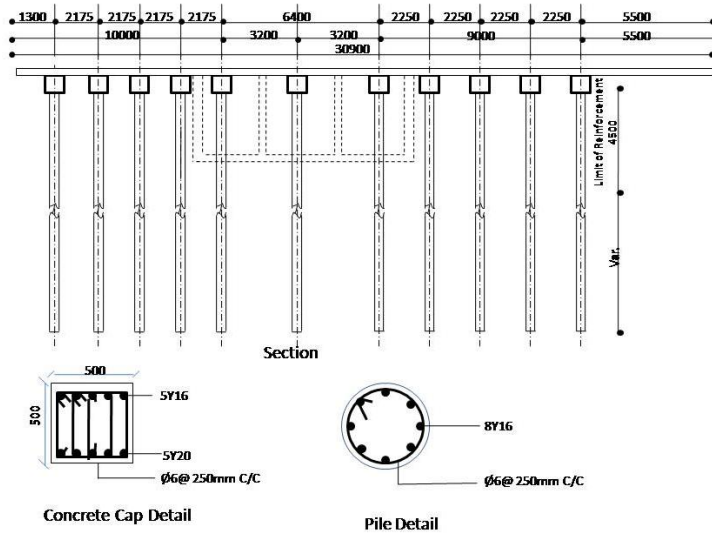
Drilling Platform showing the cellar slab, hardstand area and piling layout
